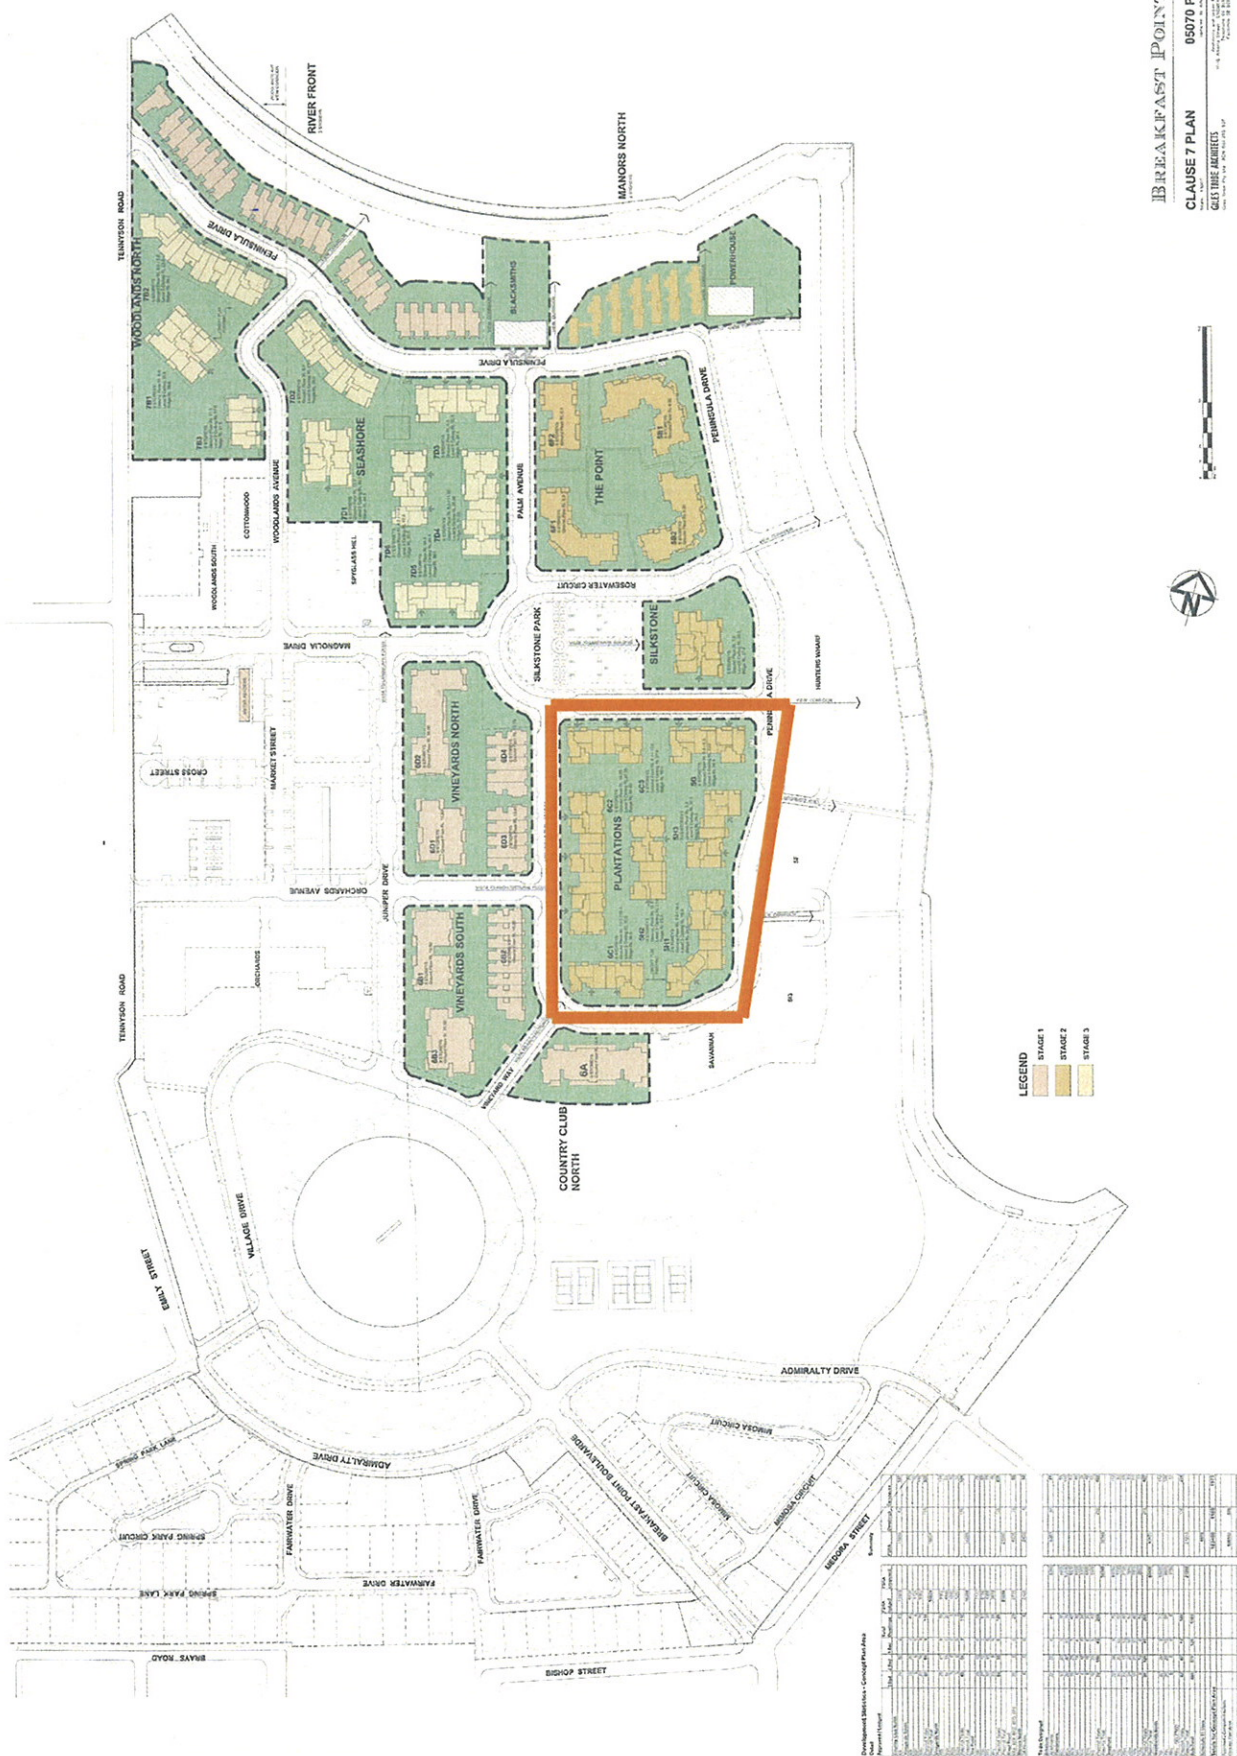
Plantation Precinct within approved Concept Plan (Shaded green)
